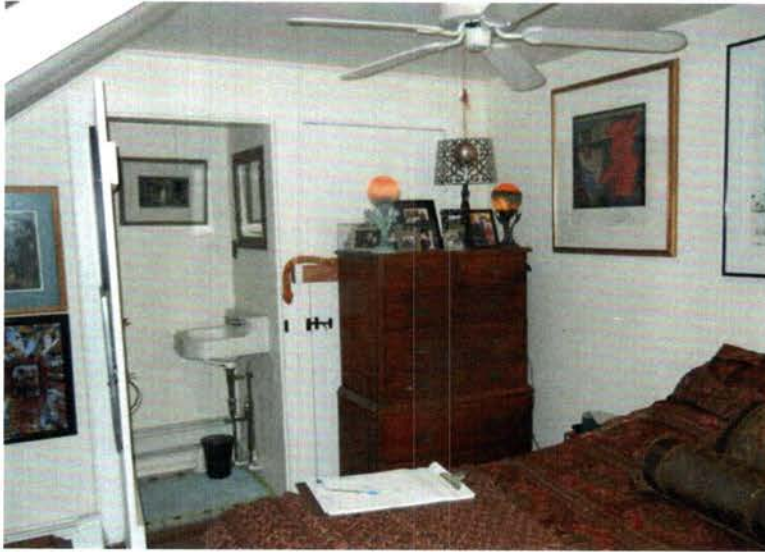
Bedroom #5 (Room 204) looking NE. Once a large open room, the partition to the right (head of bed) postdates the HABS drawings. It was constructed to create a separate Living Room (Room 2014A) for the caretaker's apartment.
